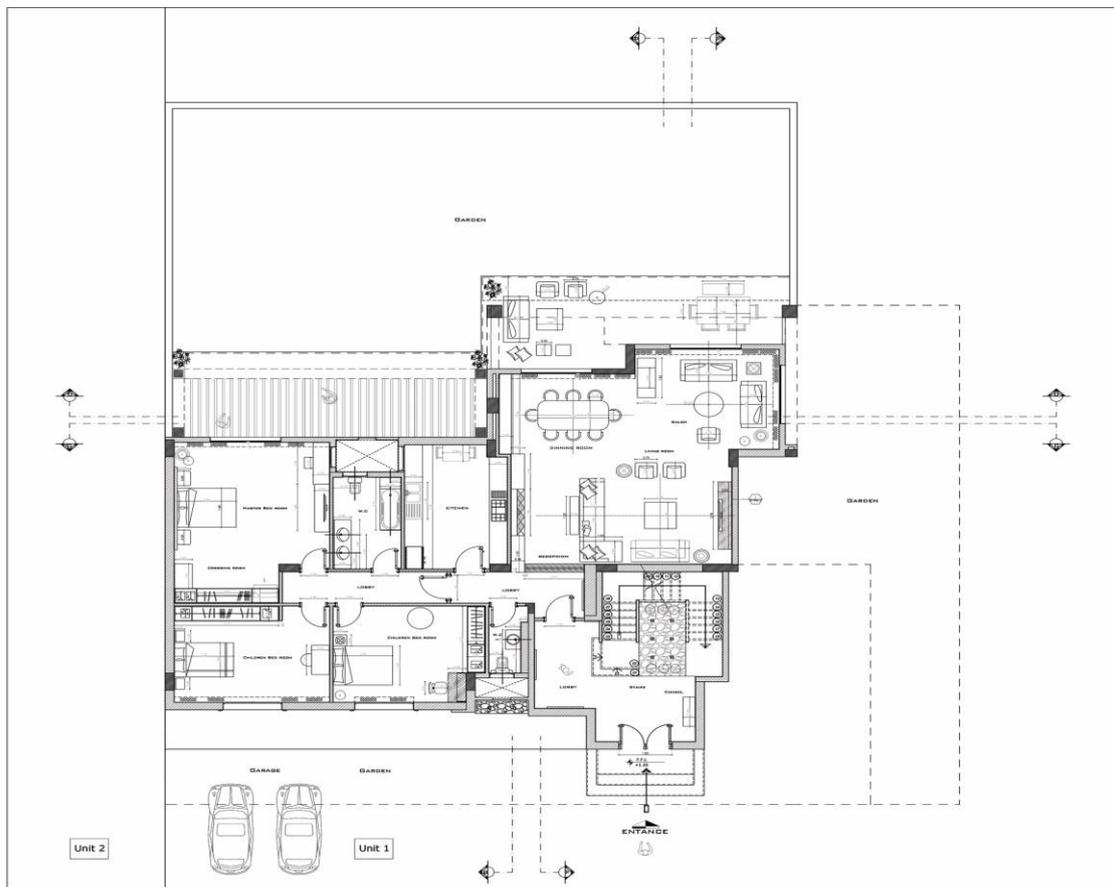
Furniture Ground Floor Plan of Townhouse project. (source: Auther,2021).
